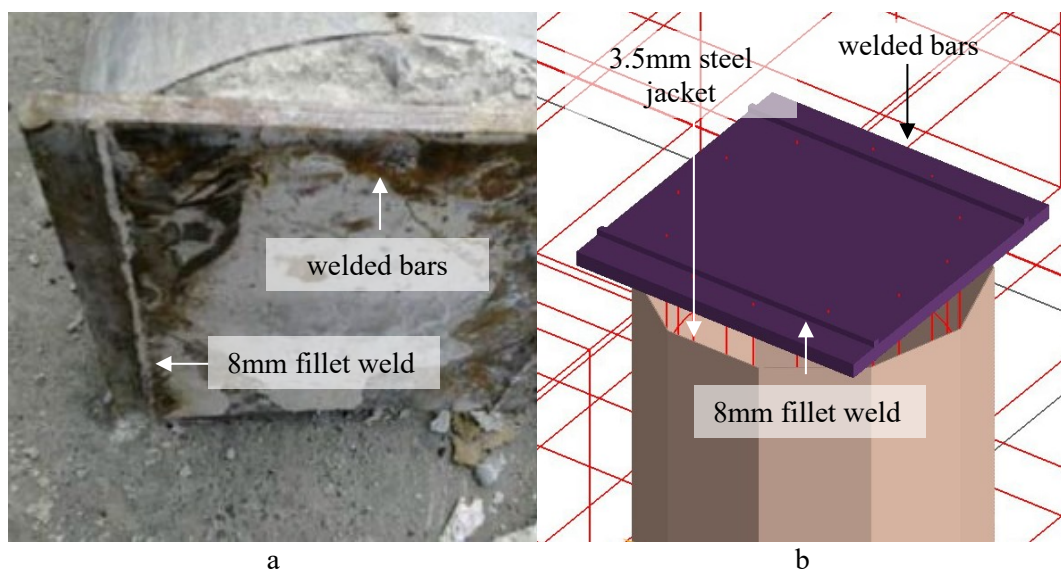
Steel plate and circular column's steel jacket, original drawings (a) and numerical model (b).
